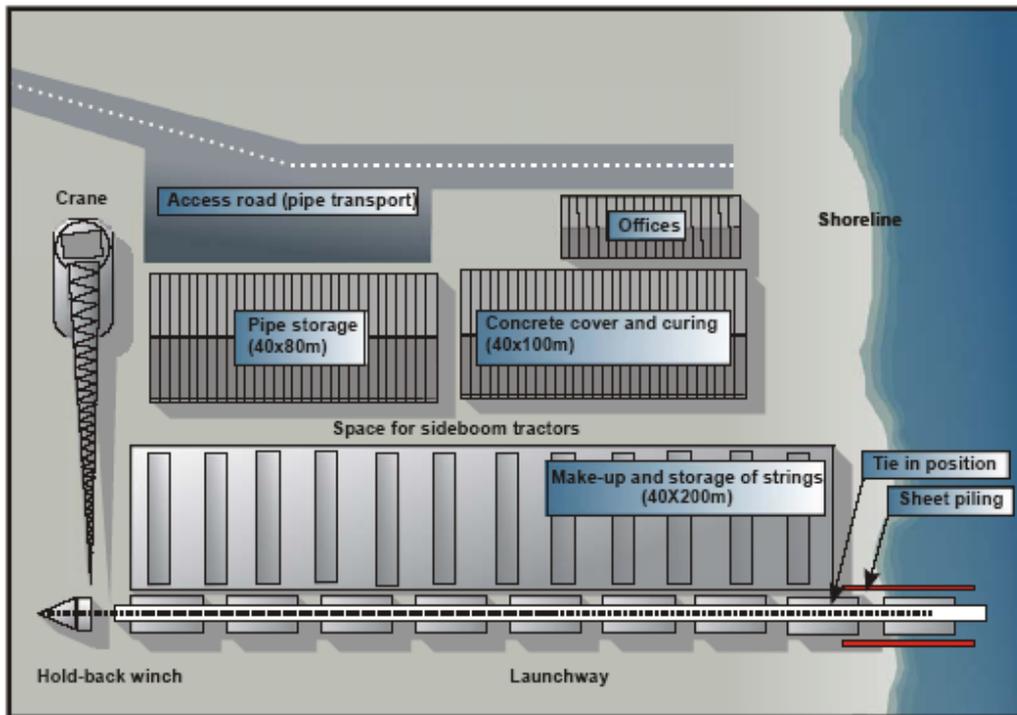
A typical construction-launching site for the bottom-pull method
